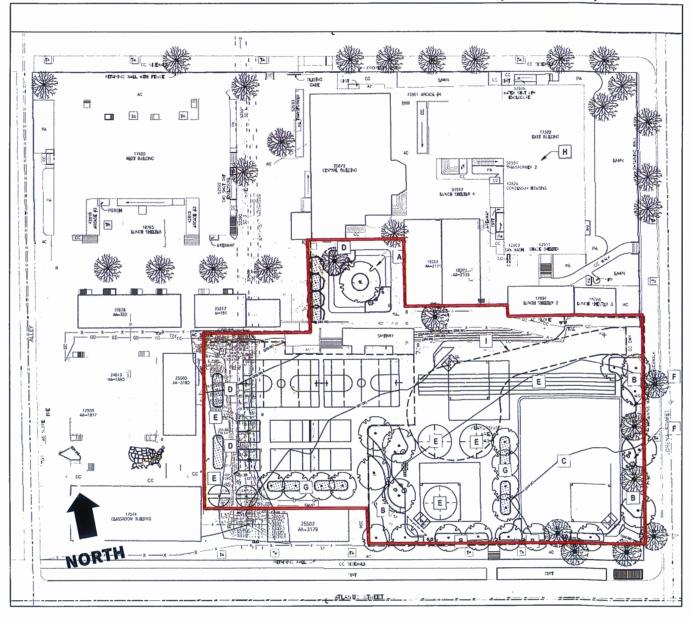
## EXHIBIT A - TERESA HUGHES ES SITE PLAN (not to scale)
